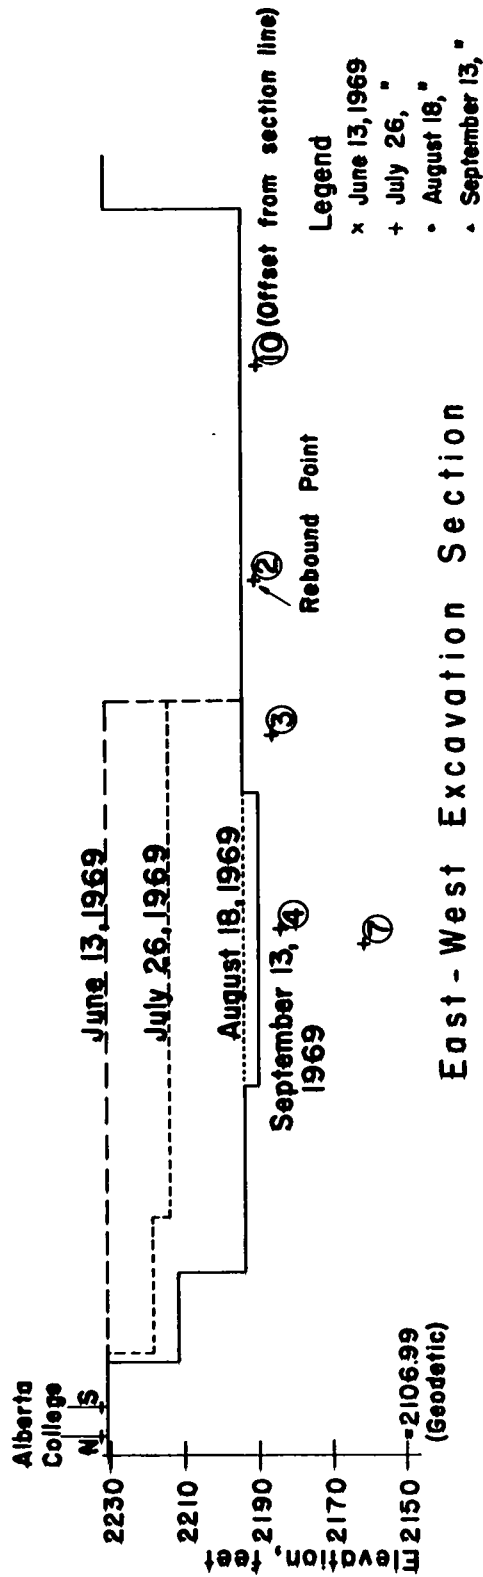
Excavation Section and Heave Profile, AGT - Oxford Complex
